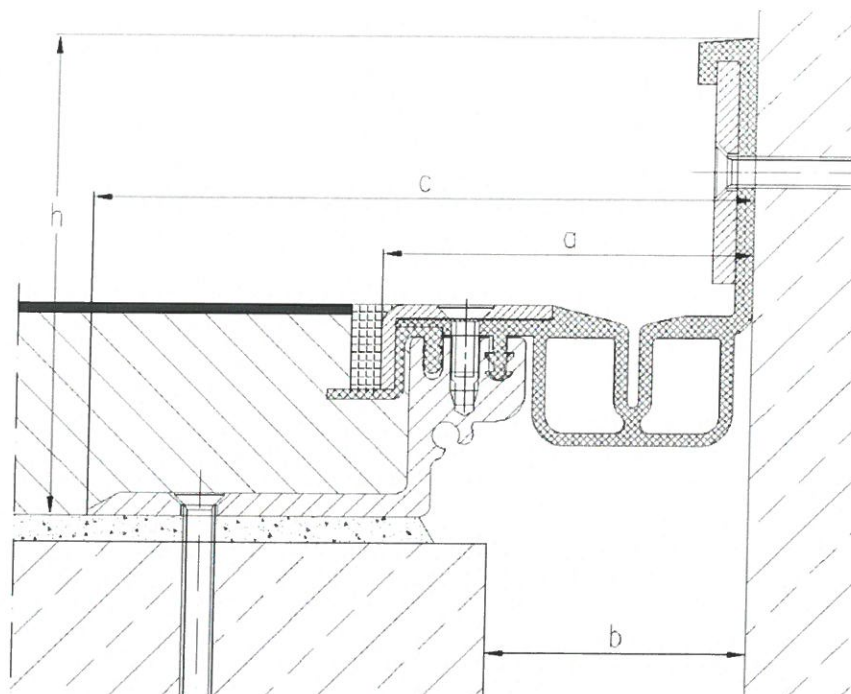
CONECTO PARK GA 63.30.CV S waterproof expansion joint profile
